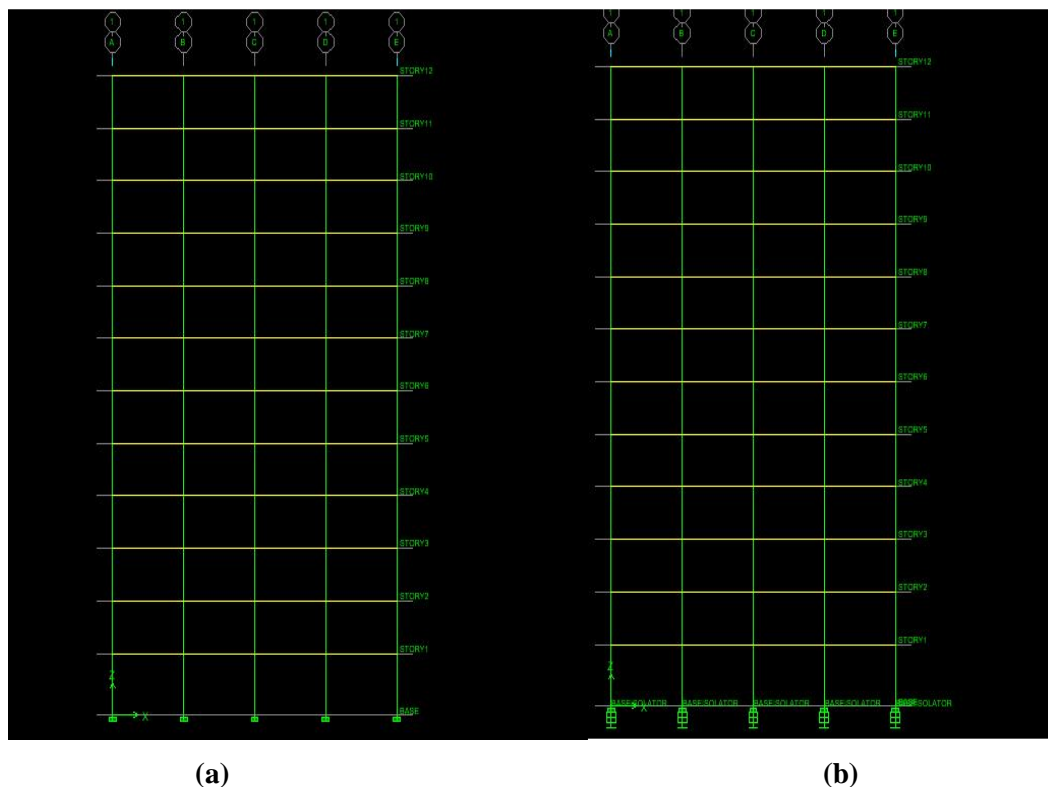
a) Elevation of the Fixed Base Building Model (b) Elevation of the Isolated Base Building Model
